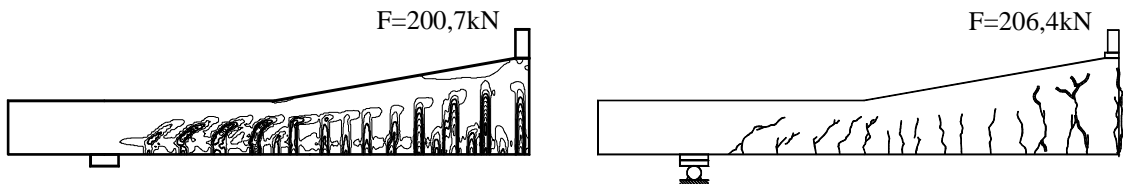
Crack propagation at failure of test beam 5L1 from Non-FEM and test
